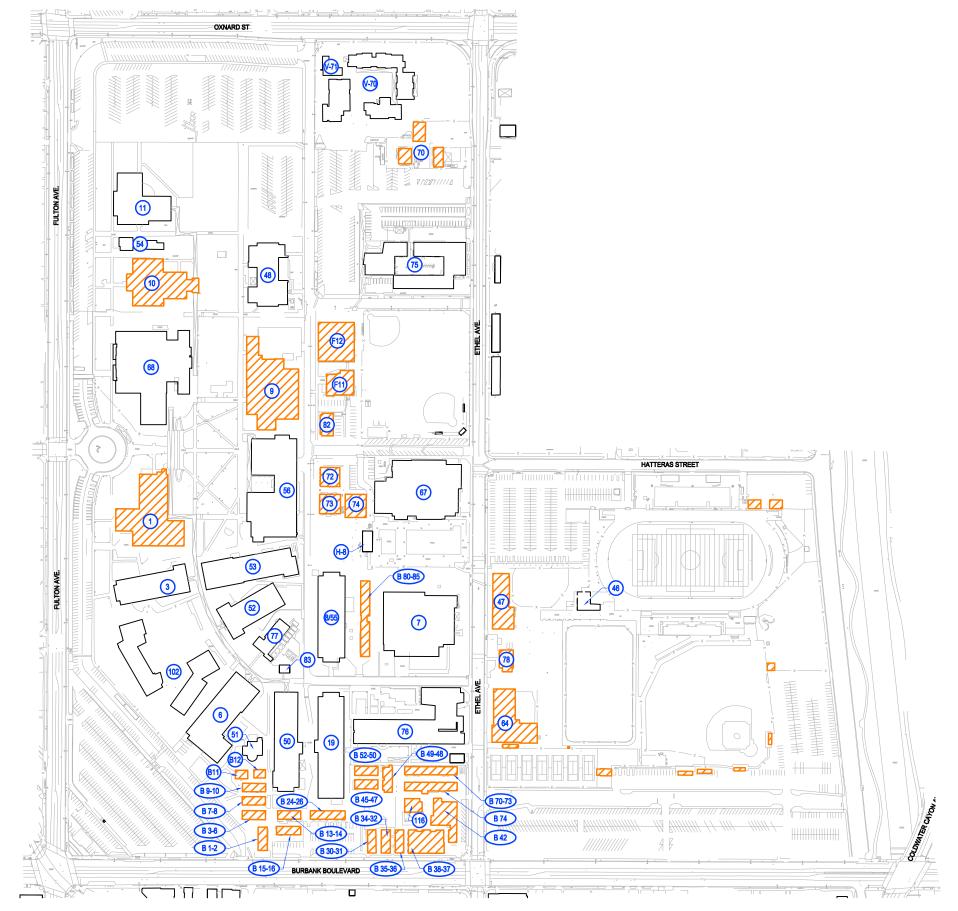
OVERALL CAMPUS MAP - BUILDING DEMOLITION PLAN
